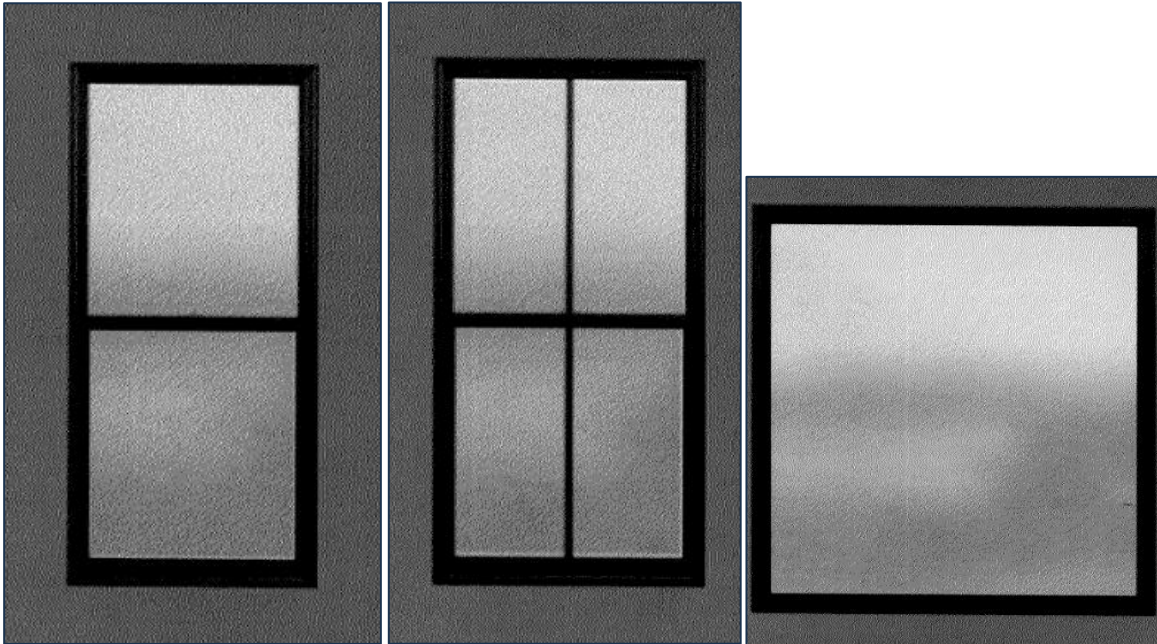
Example of proposed windows (Four 1/1, One 2/2, One Picture Window).
